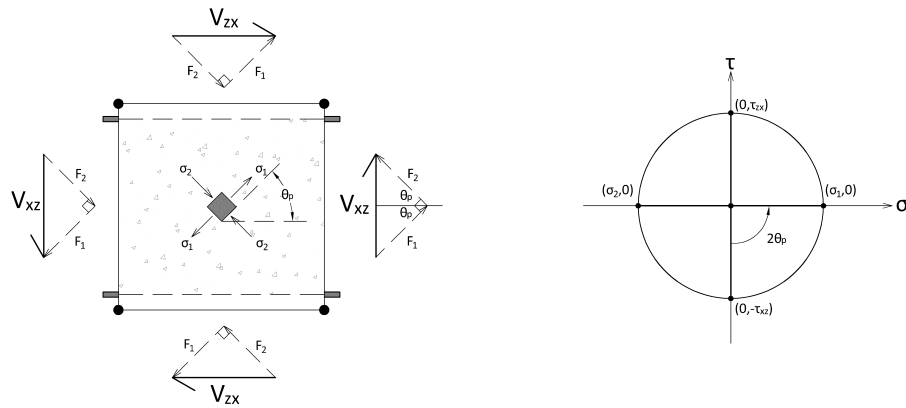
Force Equilibrium (Left) and Stress State (Right) for Shear in Uncracked Reinforced Concrete
